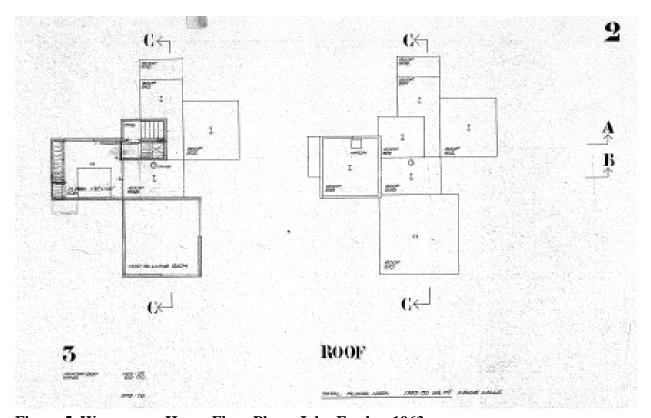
Wasserman House Floor Plans, John Fowler, 1963.
